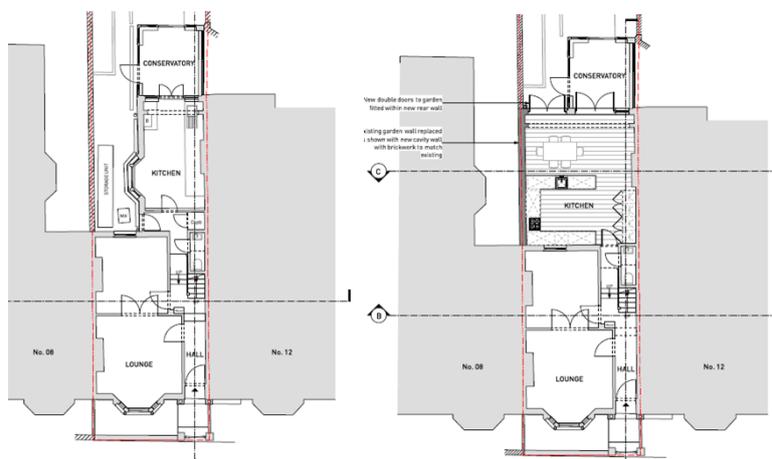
Existing and proposed ground floor plans (left and right, respectively).
